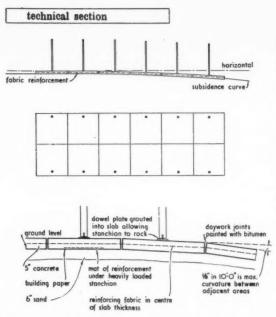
, site slab. Top diagram, section showing caterpillar effect (vertical scale is exaggerated). Tensional fabric reinforcement continuous through separate squares of concrete to tie all together and maintain stanchion spacing at foot and prevent slab being torn apart. Centre diagram, plan of slab showing daywork joints in concrete. Bottom diagram, section showing construction of slab.
